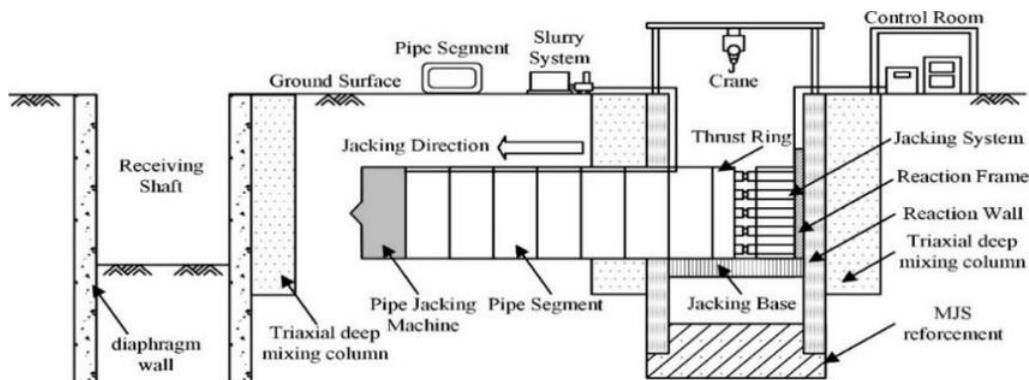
Cross-section of a typical pipe jacking construction method ³
